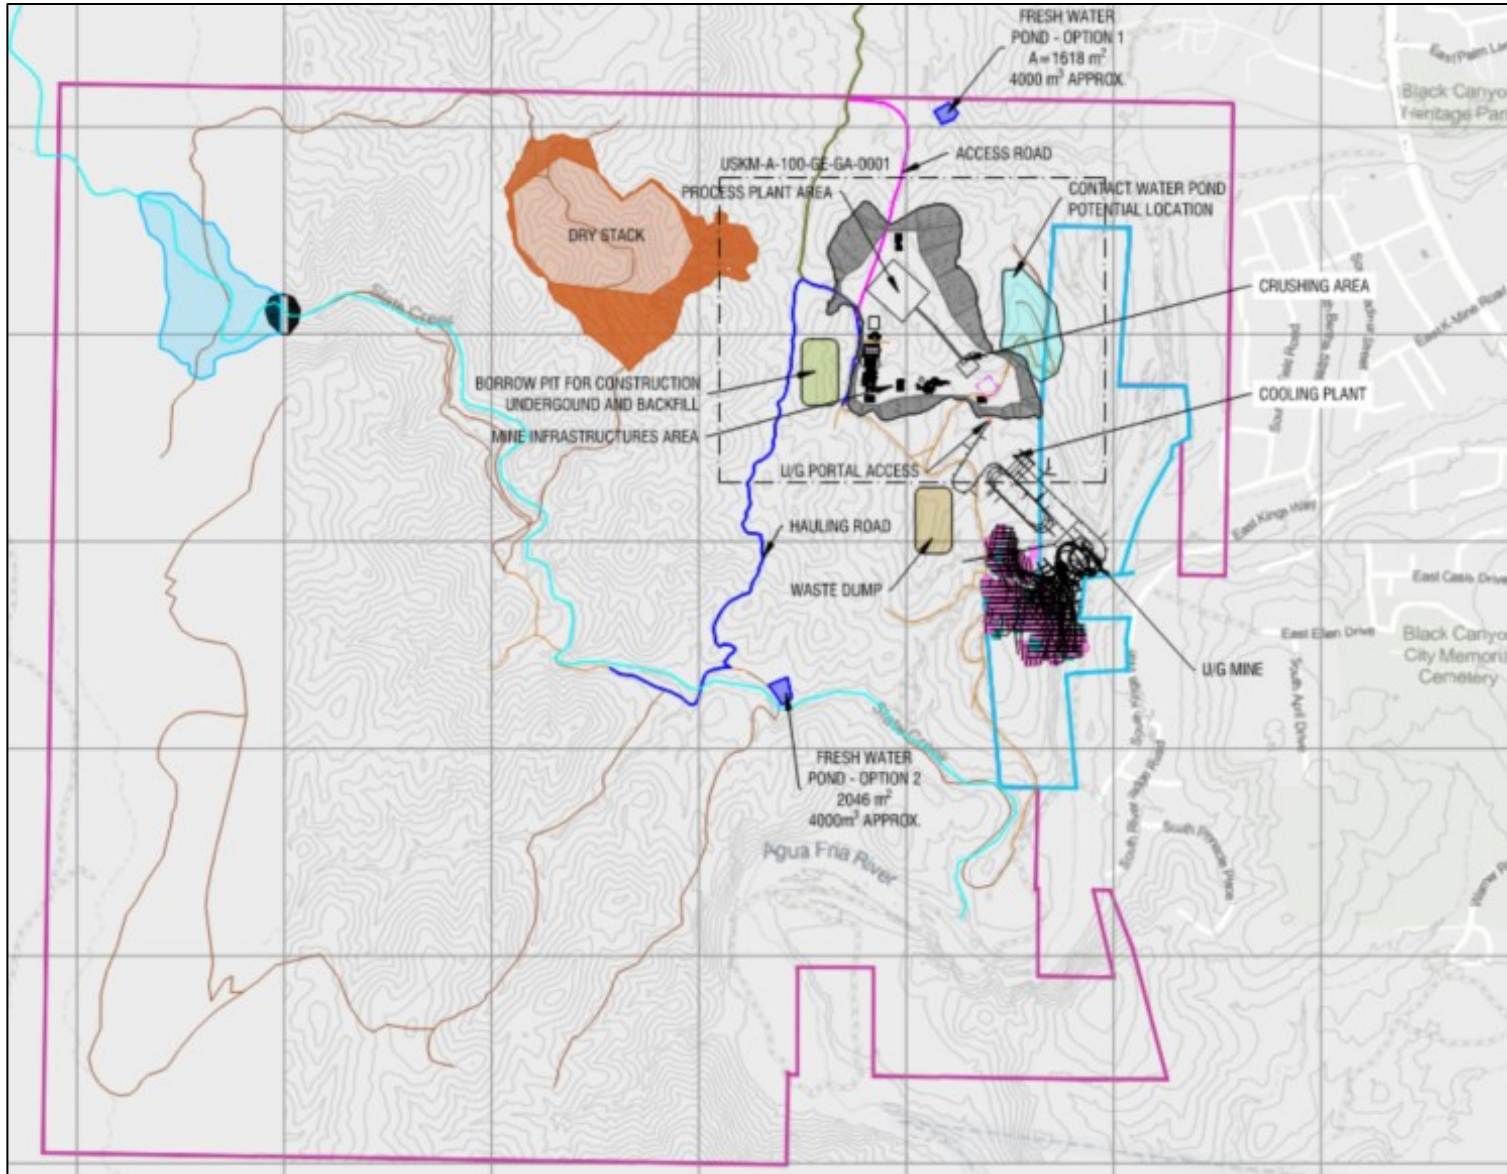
illustrates the Project site plan, presenting the on-site infrastructure. This plan is designed to minimize environmental impacts, provide secure site access, minimize construction costs, and enhance operational efficiency. It shows the proposed mine, process plant, the various surface infrastructures and the various access roads.
